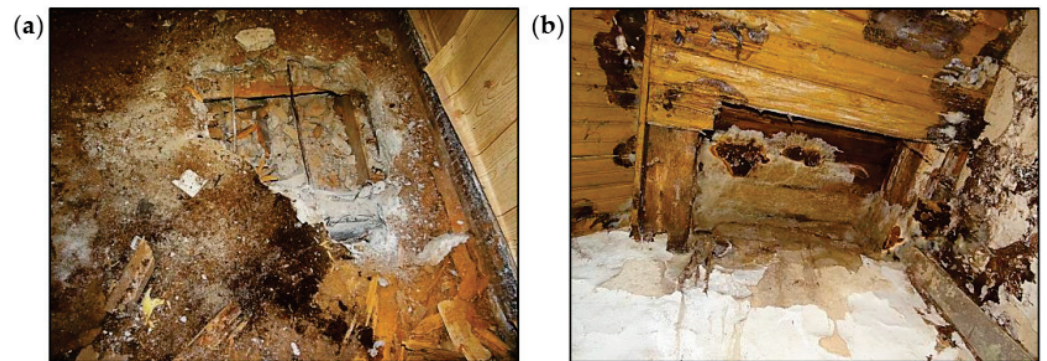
Ceiling opencasts: (a) from the top of the reinforcement concrete ceiling and (b) from the bottom of the wooden ceiling.
